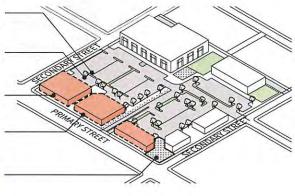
Renovated Commercial Center with more commercial buildings - New commercial buildings added to densify the commercial center, provide active frontages towards the street, and reduce the negative impacts of parking on the public realm.
